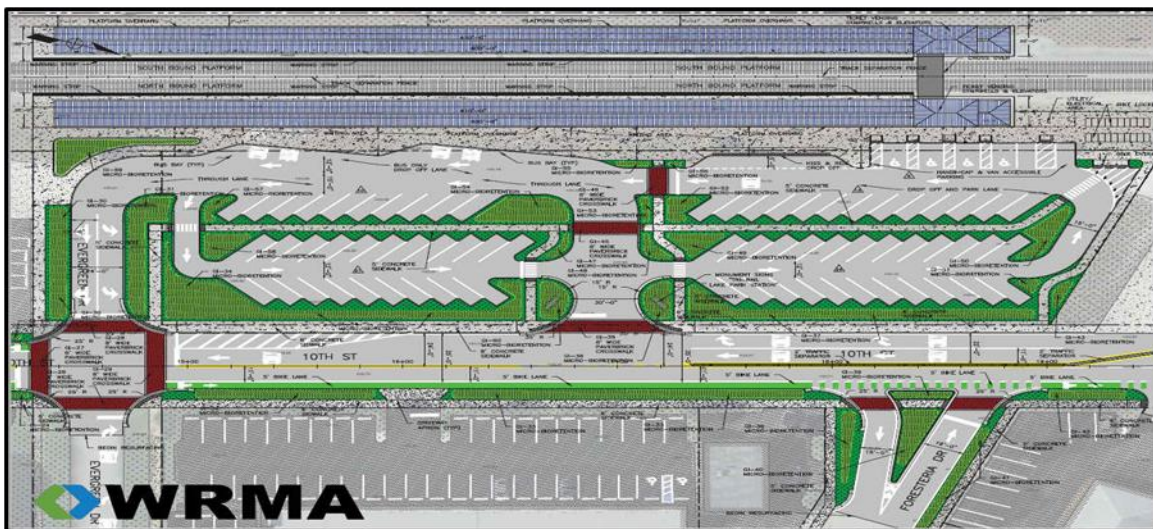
Proposed Tri-Rail Station Concept at 10th Street
